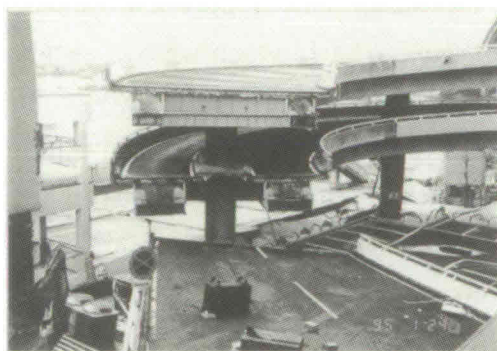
Fallen loop bridge on the approach to the Kobe-Ohashi Bridge
